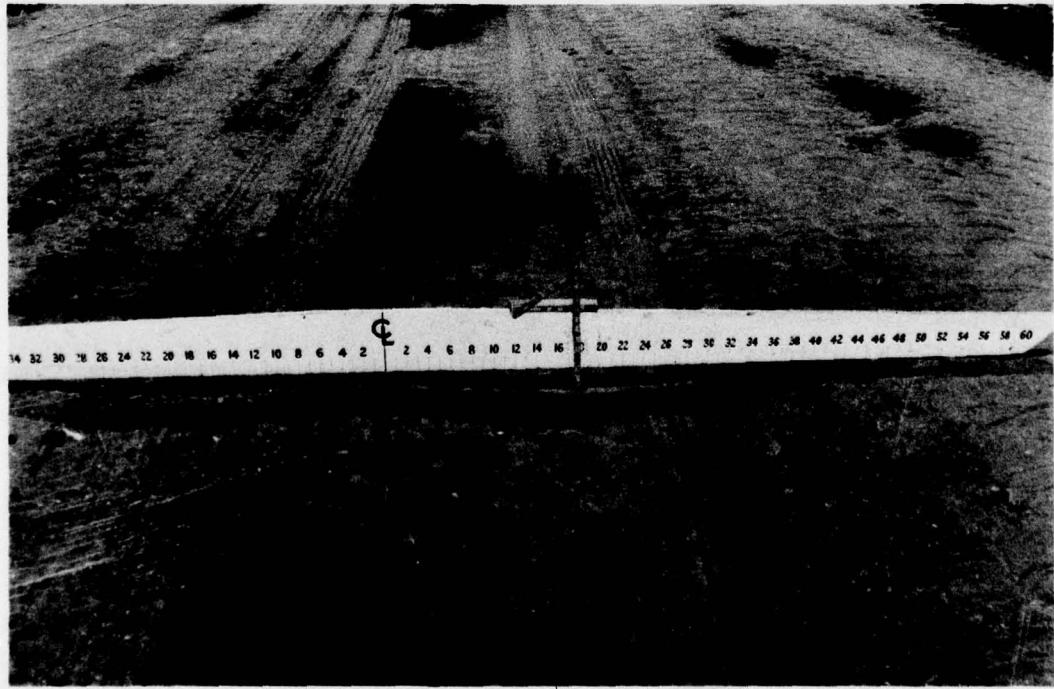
General view of Test Section No. 2, item 3, at end of traffic
